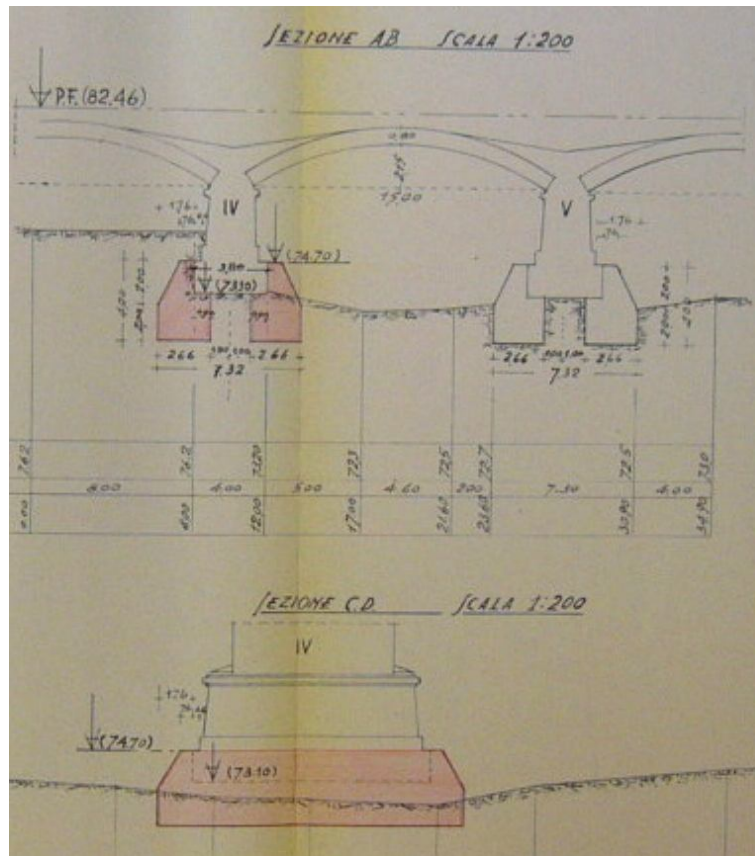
San Polo Bridge: details of the arch and of the foundations.
